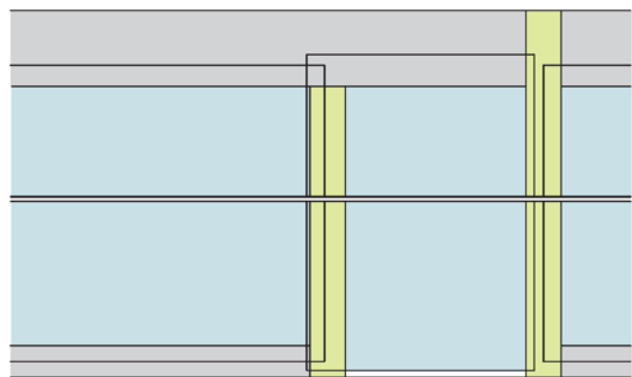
TYPICAL ELEVATION OF SINGLE GLASS SLIDING DOOR
